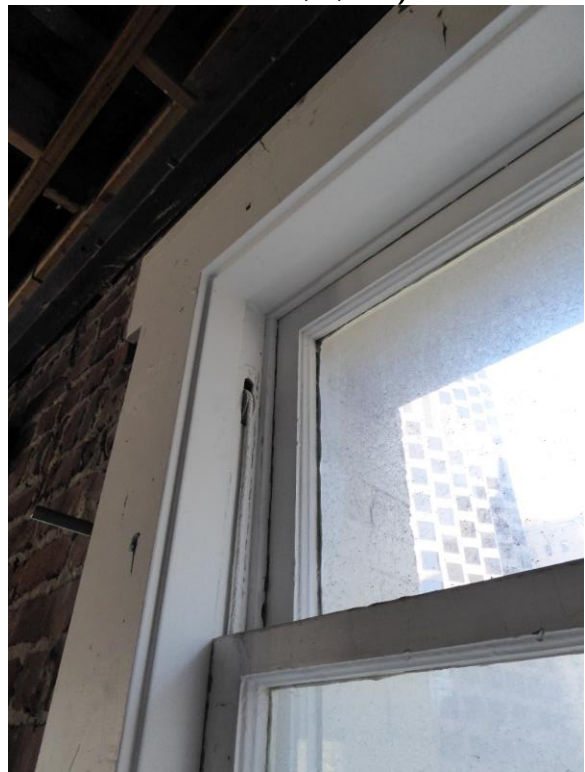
Detail photograph of typical window trim and sash configuration (photograph was taken on 02/27/2018).
